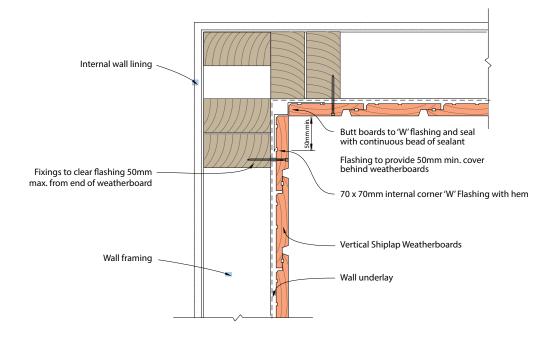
Vertical Shiplap - Internal 90° Corner - Flashing
